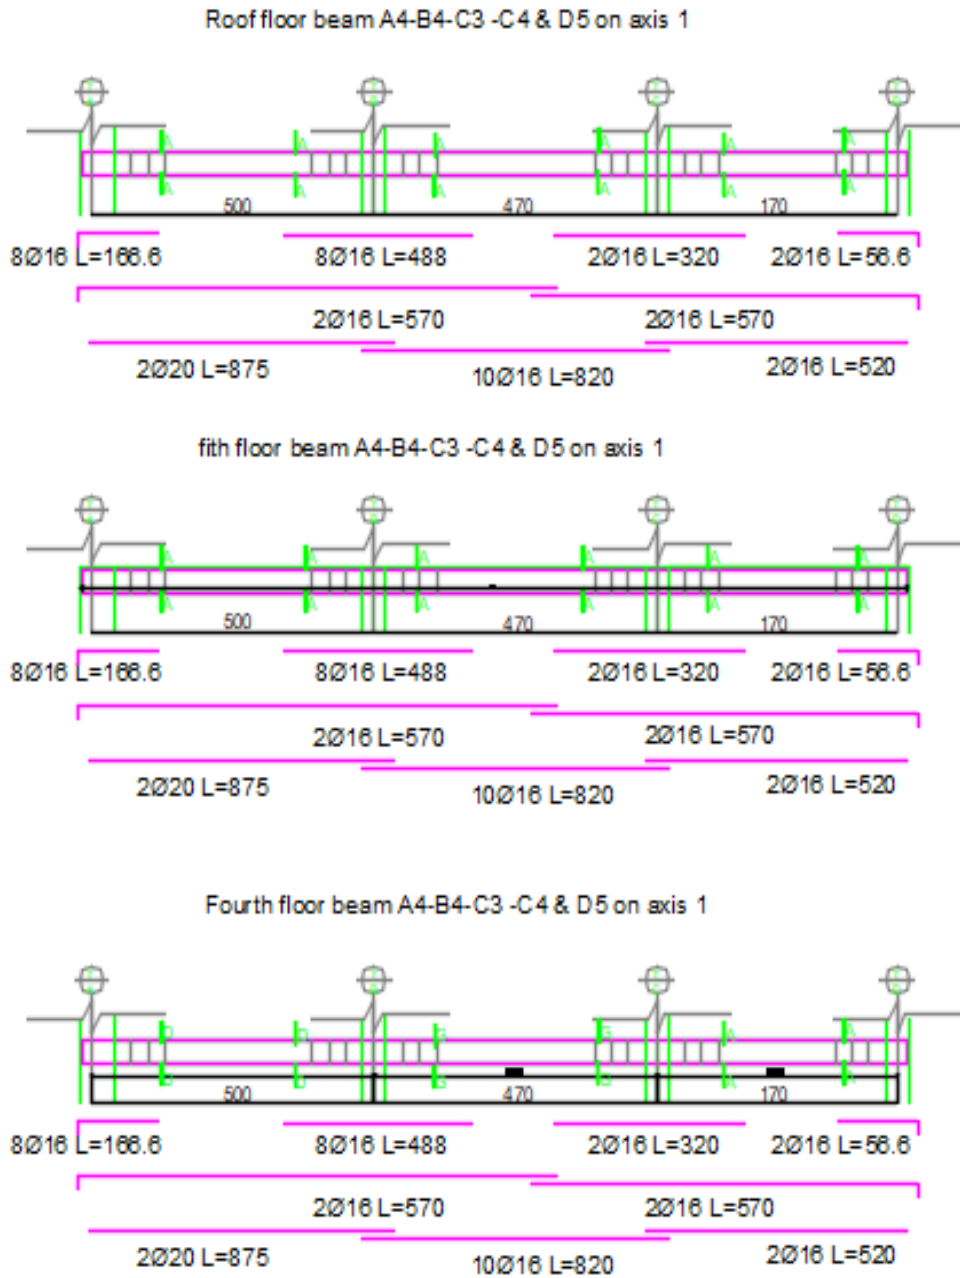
Reinforcement detail for roof, fifth & fourth floor
